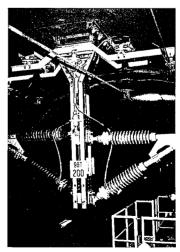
Titanium catenary drop arm in New Kanmon Tunnel
